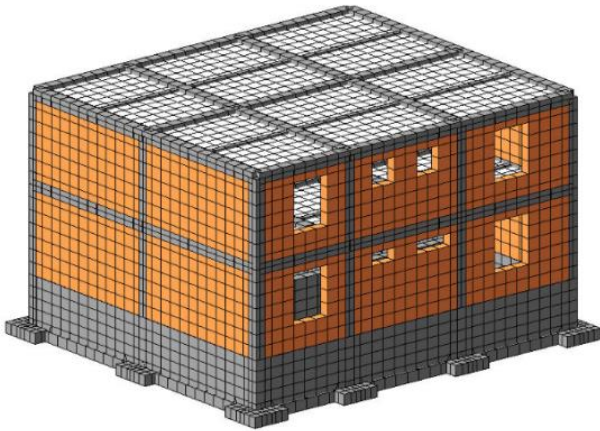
The calculation model of a residential building with rigid external enclosing brick walls to a reinforced concrete frame
